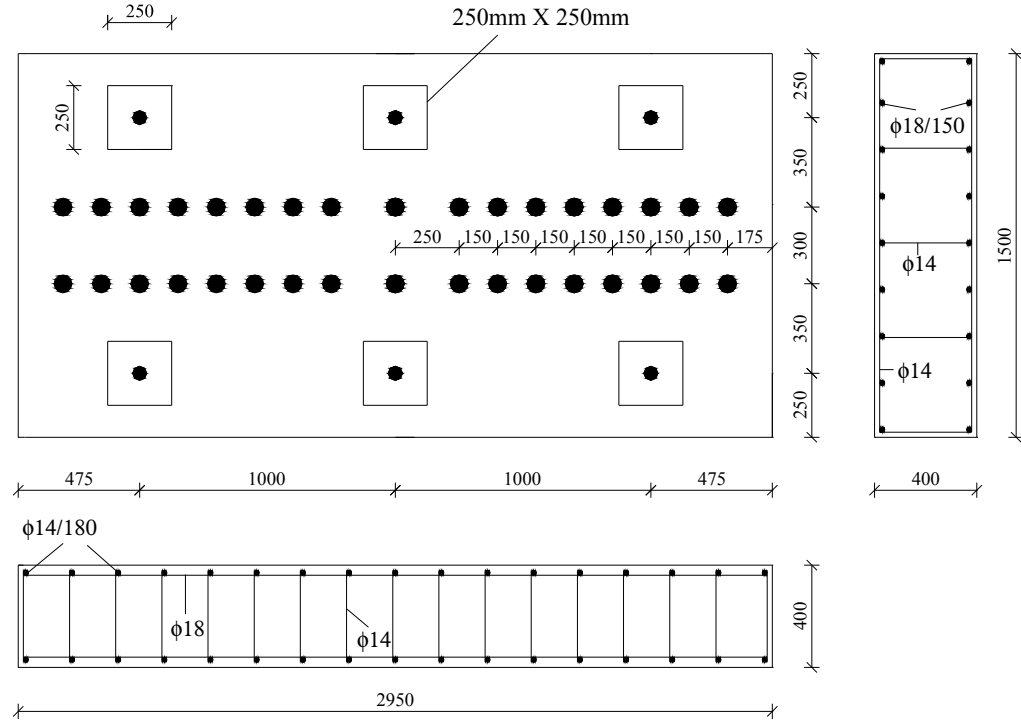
Detailed drawing of the universal base (All dimensions are in mm)
